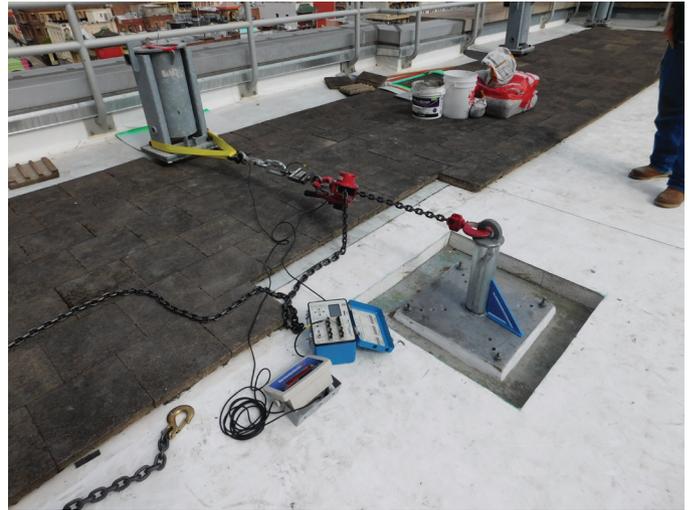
Load test of fall arrest anchorage (right) reacting off a davit base (left)
